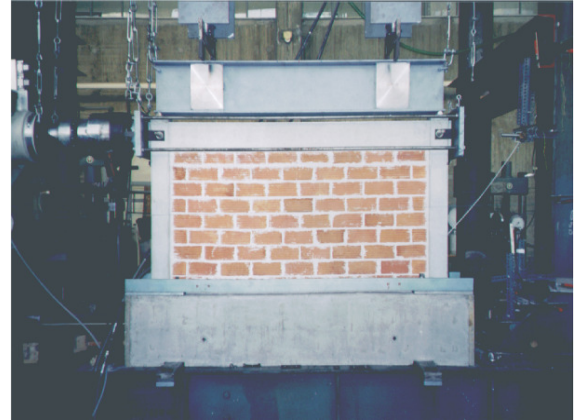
Test set up of frame with repaired masonry infill F3N(R1f,0w)*s.
